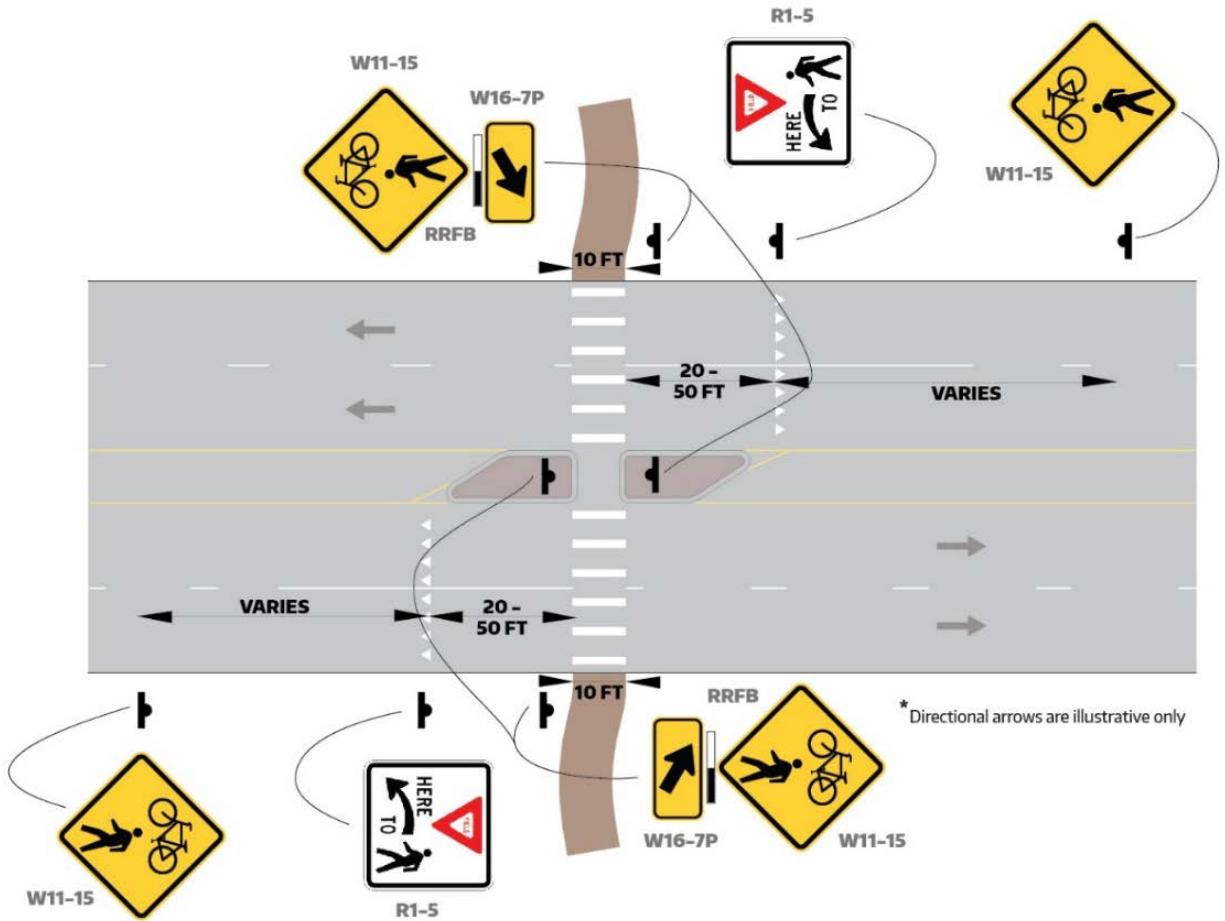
Typical High Volume Road Crossing with Rectangular Rapid Flashing Beacon (RRFB)\
